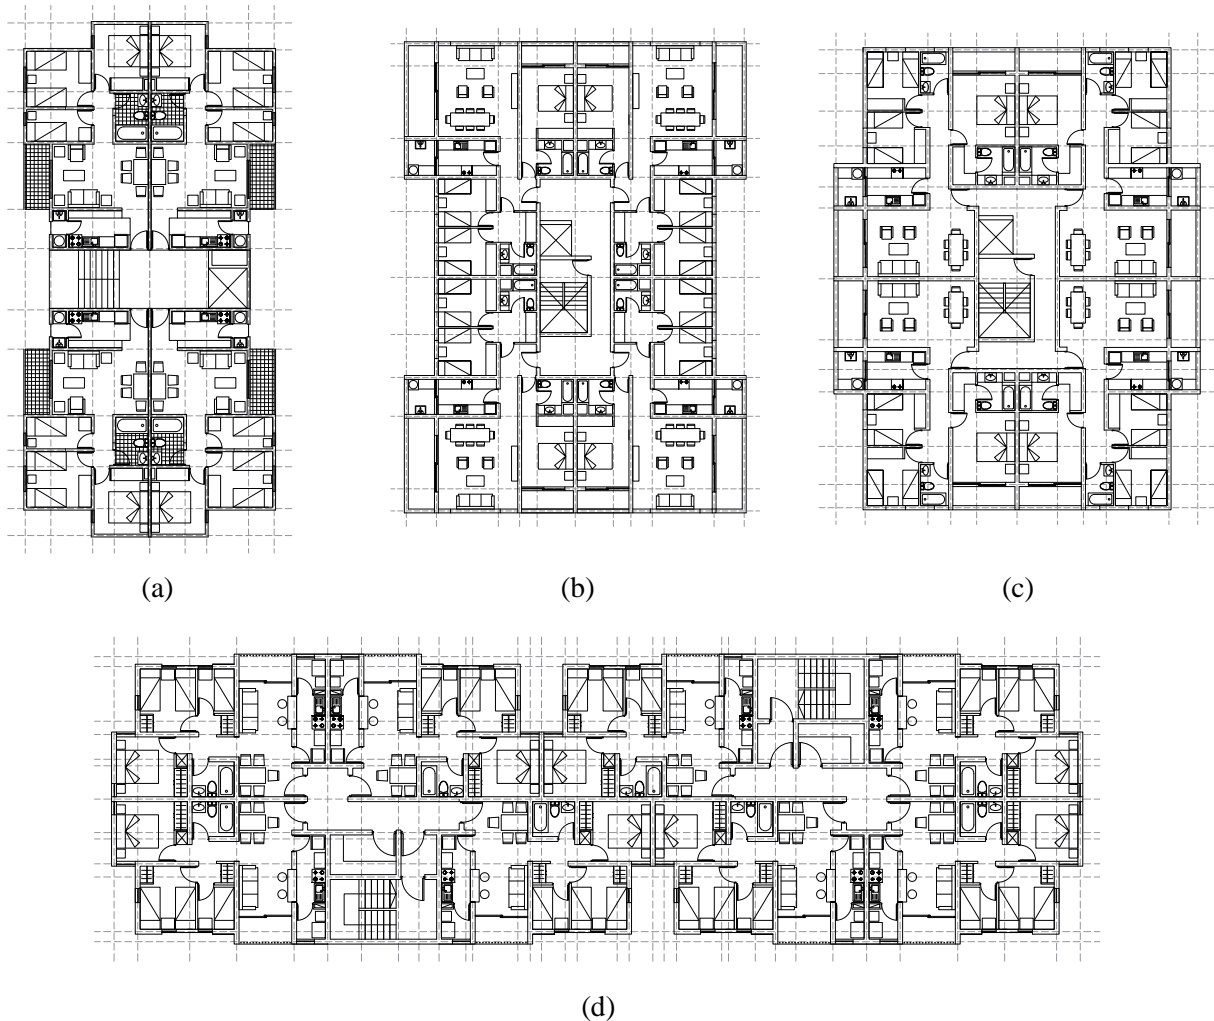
Floor plan and walls distribution of: (a) building “C”, (b) building “P”, (c) building “Q”, (d) building “D”.
